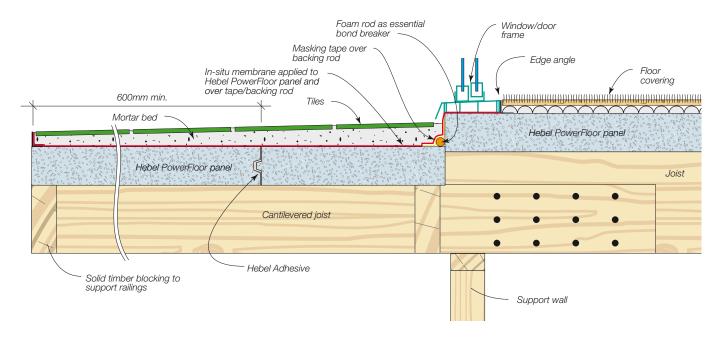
In-line Balcony with Cantilevered Joist
